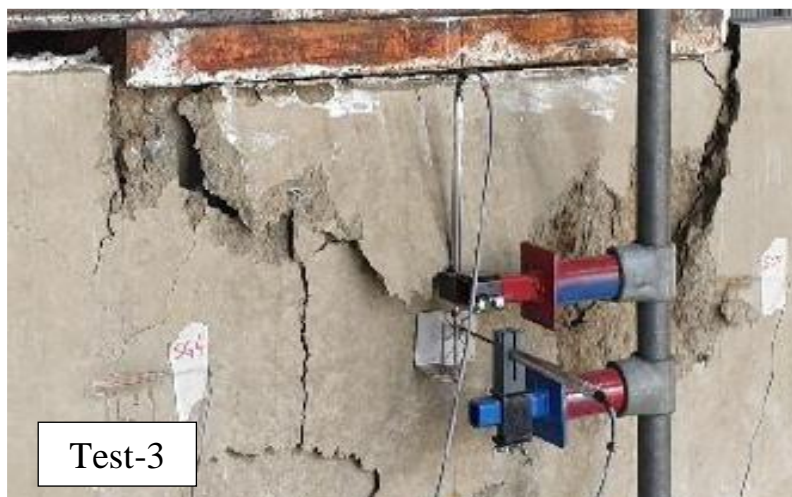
Failure behaviour in tyre-bale sandwich wall
